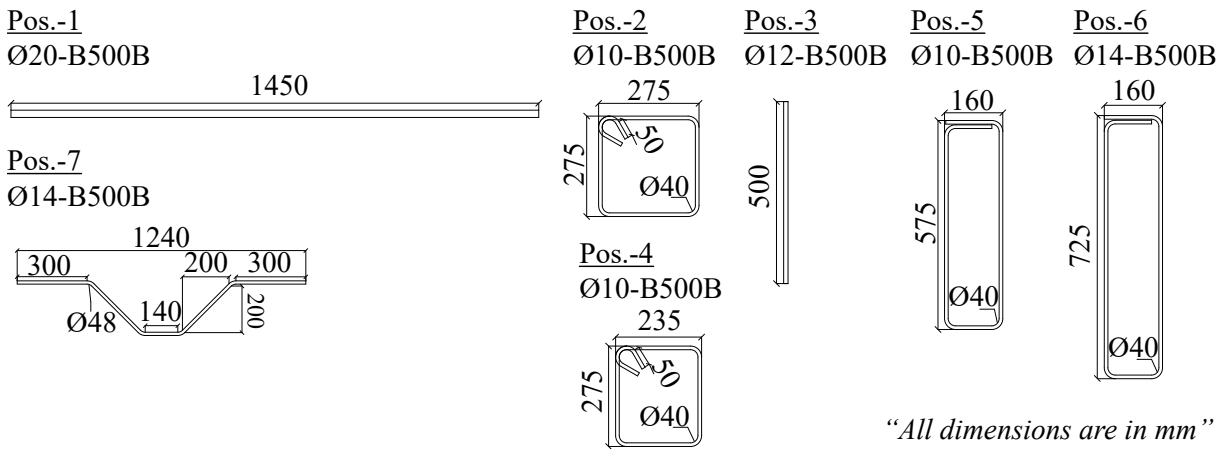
Technical drawings of the test specimens and the steel reinforcements.
